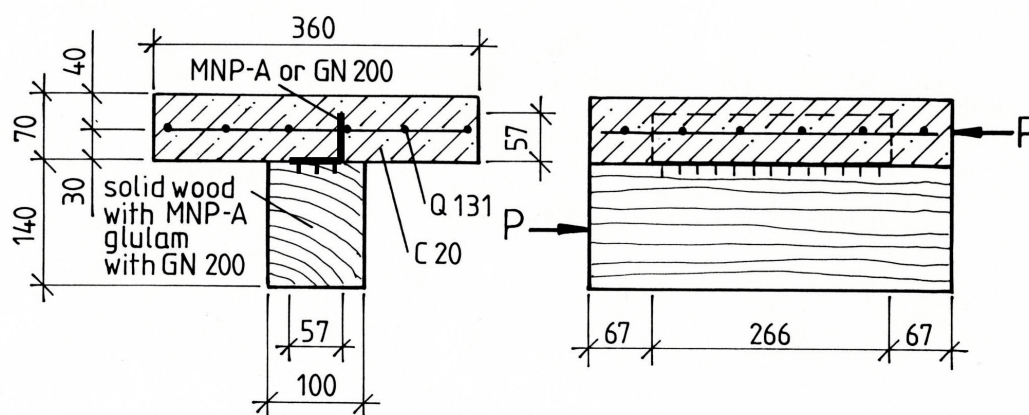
Nailplate connection investigated in [10]. The figure shows the shape / dimensions of the investigated compression shear specimens
